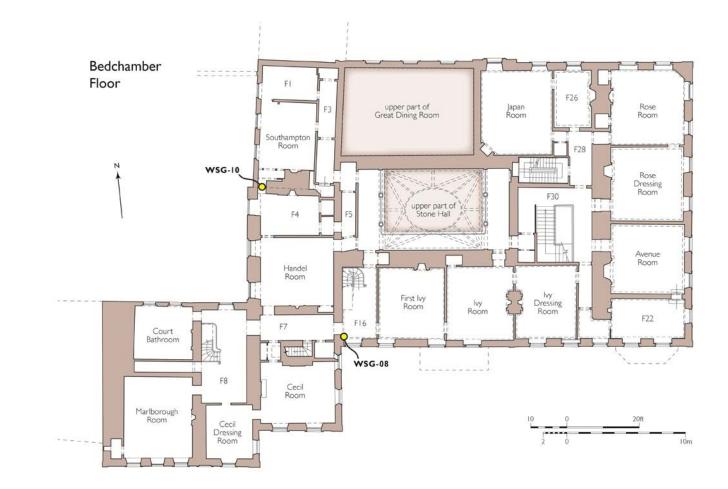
Plan of the bedchamber floor of St Giles House, showing the location of bricks sampled for luminescence dating (after Phillip Hughes Associates 2017)
